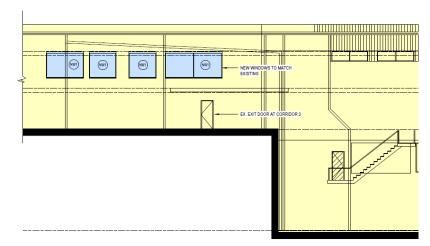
Level 4 Demolition Plan Source: Brewster Murray
